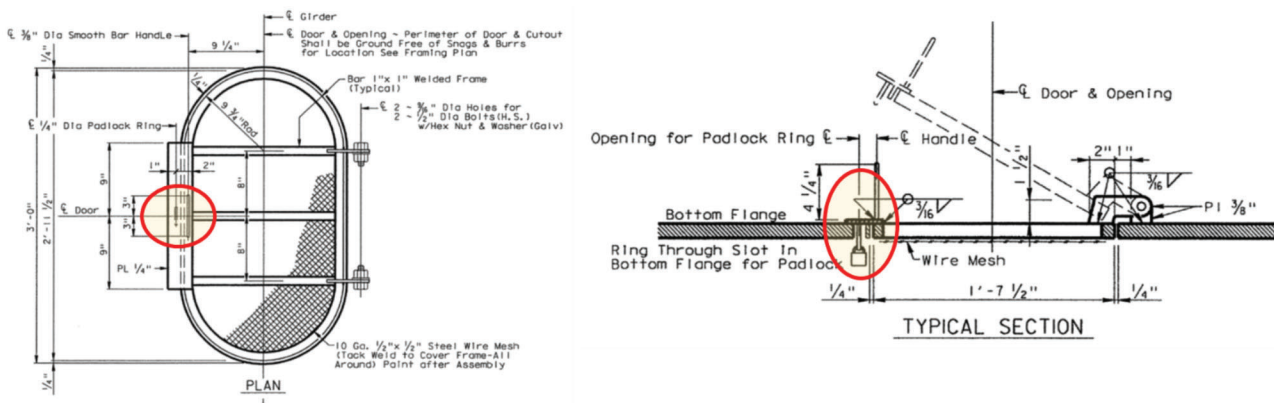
Example of tub girder inspection access hole with slot hole for lock, slot hole detail highlighted.
